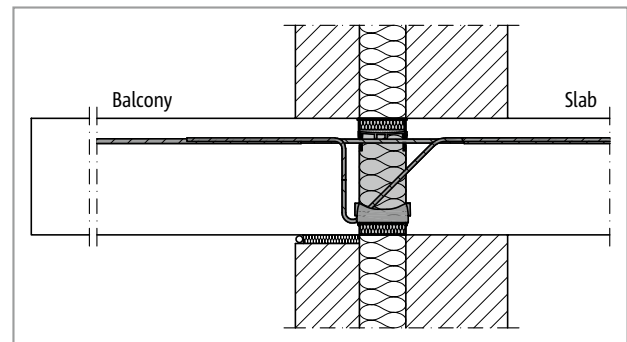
Schöck Isokorb® T type K: Cavity wall with a balcony at inner slab level
